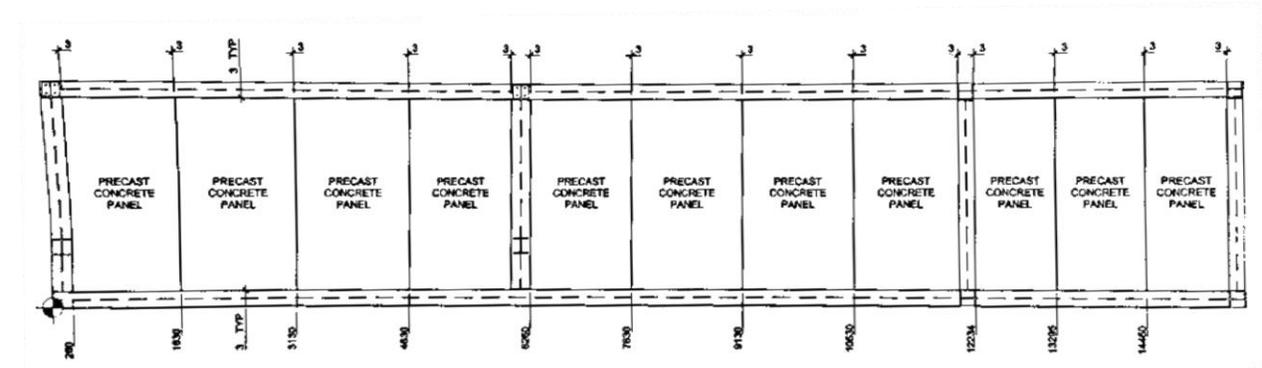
Width of each precast concrete panel, with a 3 mm tolerance for spacing between panels
